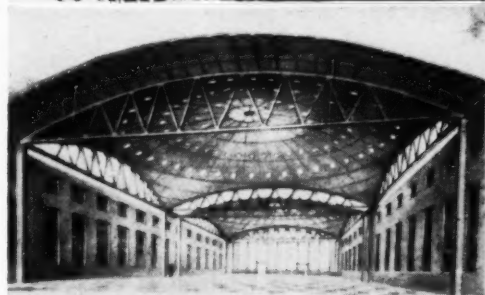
Precast dome of 133-ft diameter is raised 66 ft by hydraulic jacks to rest on top of four hollow precast columns. Dome consists of 135 pieces of 16 different shapes, seen being assembled at ground level in photo below. Artist's sketch shows completed twin-domed factory building.
